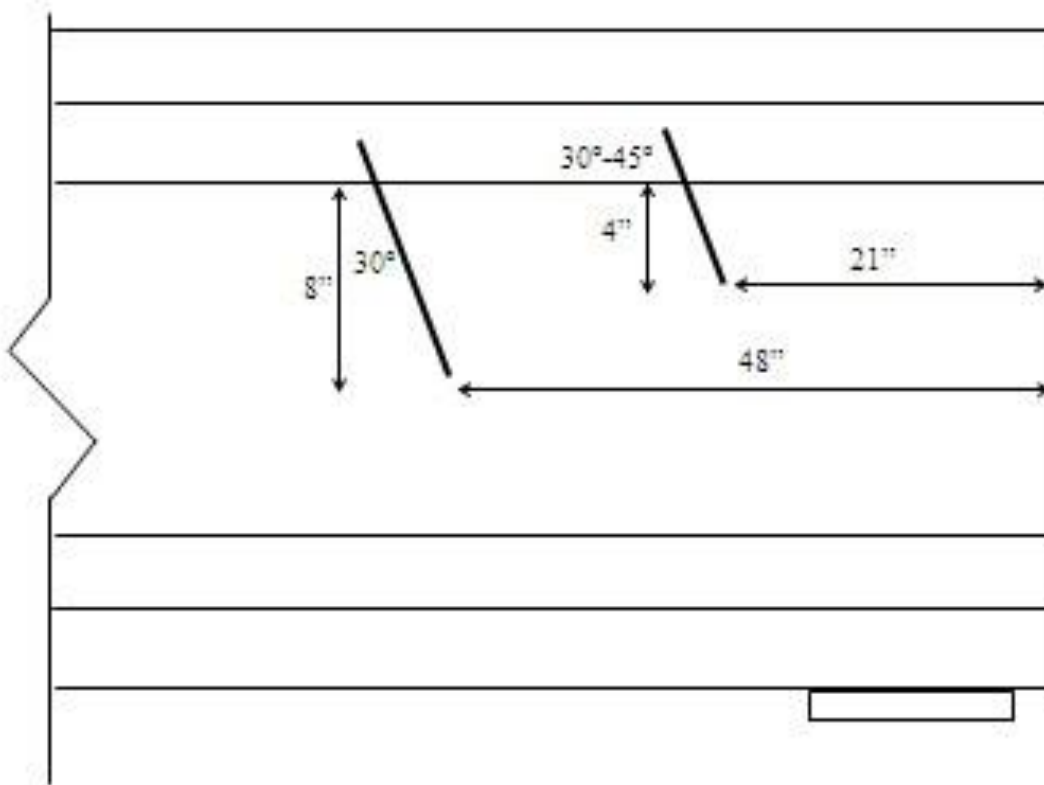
Crack diagram, girder at south span, north end, 4th beam from west side, west face (#7933).
